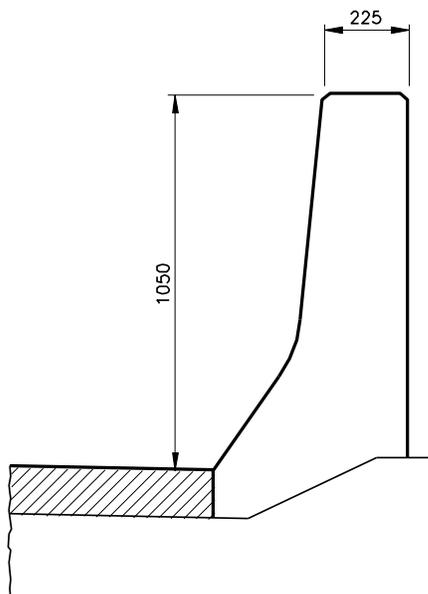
Barrier Wall Without Railing (TL-5)
